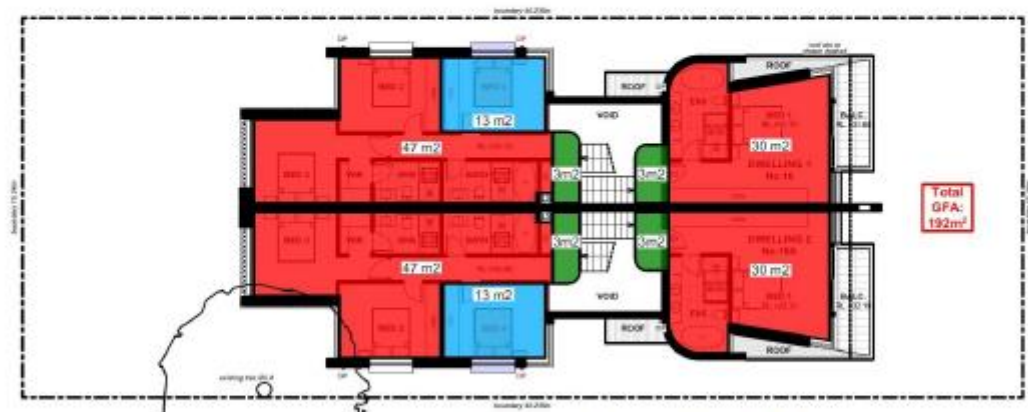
First Floor GFA Calculation Plan (GFA: 192m²)
